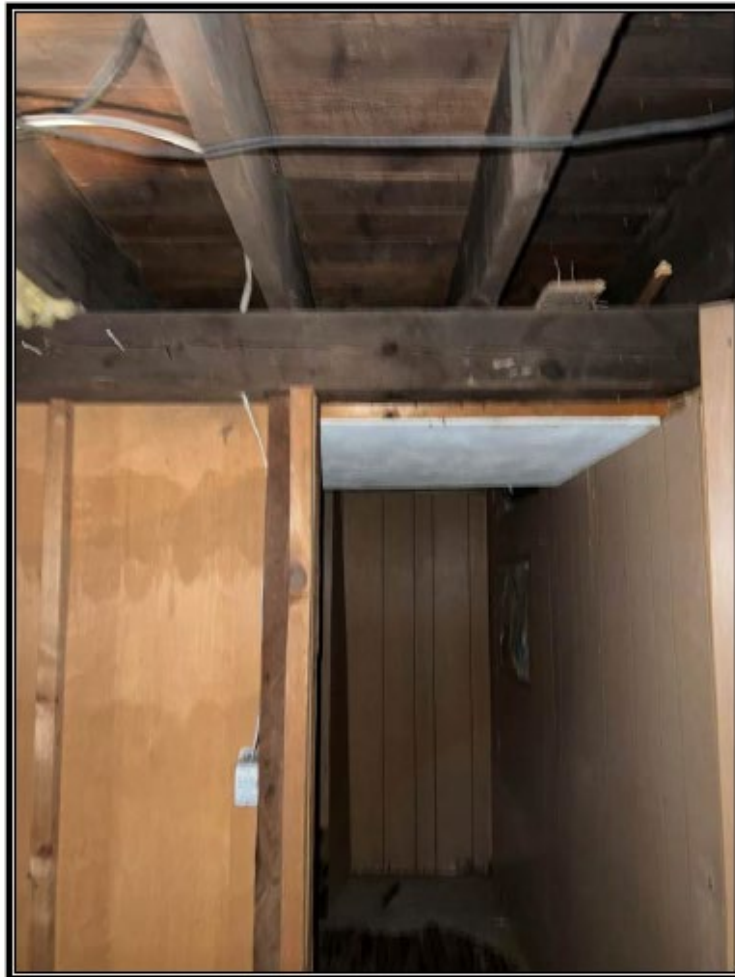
A room in the mazement. The basement walls have been covered so are not exposed to view.
